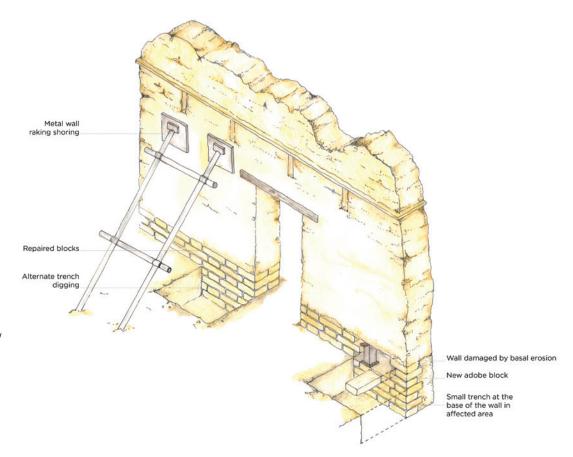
System of basal erosion repair, including shoring support, archaeological excavation in alternating trenches, and insertion of new mud bricks to reinstate the load-carrying capacity of the wall. Source: Alessandra Sprega for the J. Paul Getty Trust.
